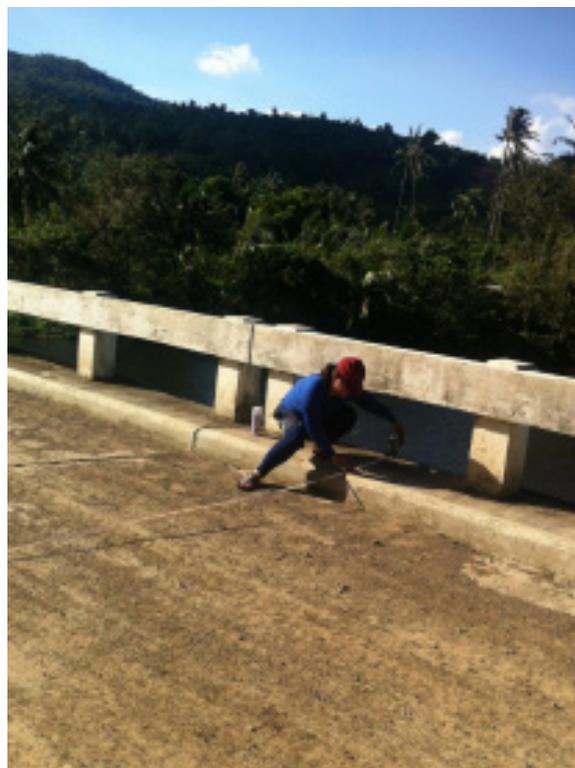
Cross-section and bridge as-built survey on Lubayat Bridge
